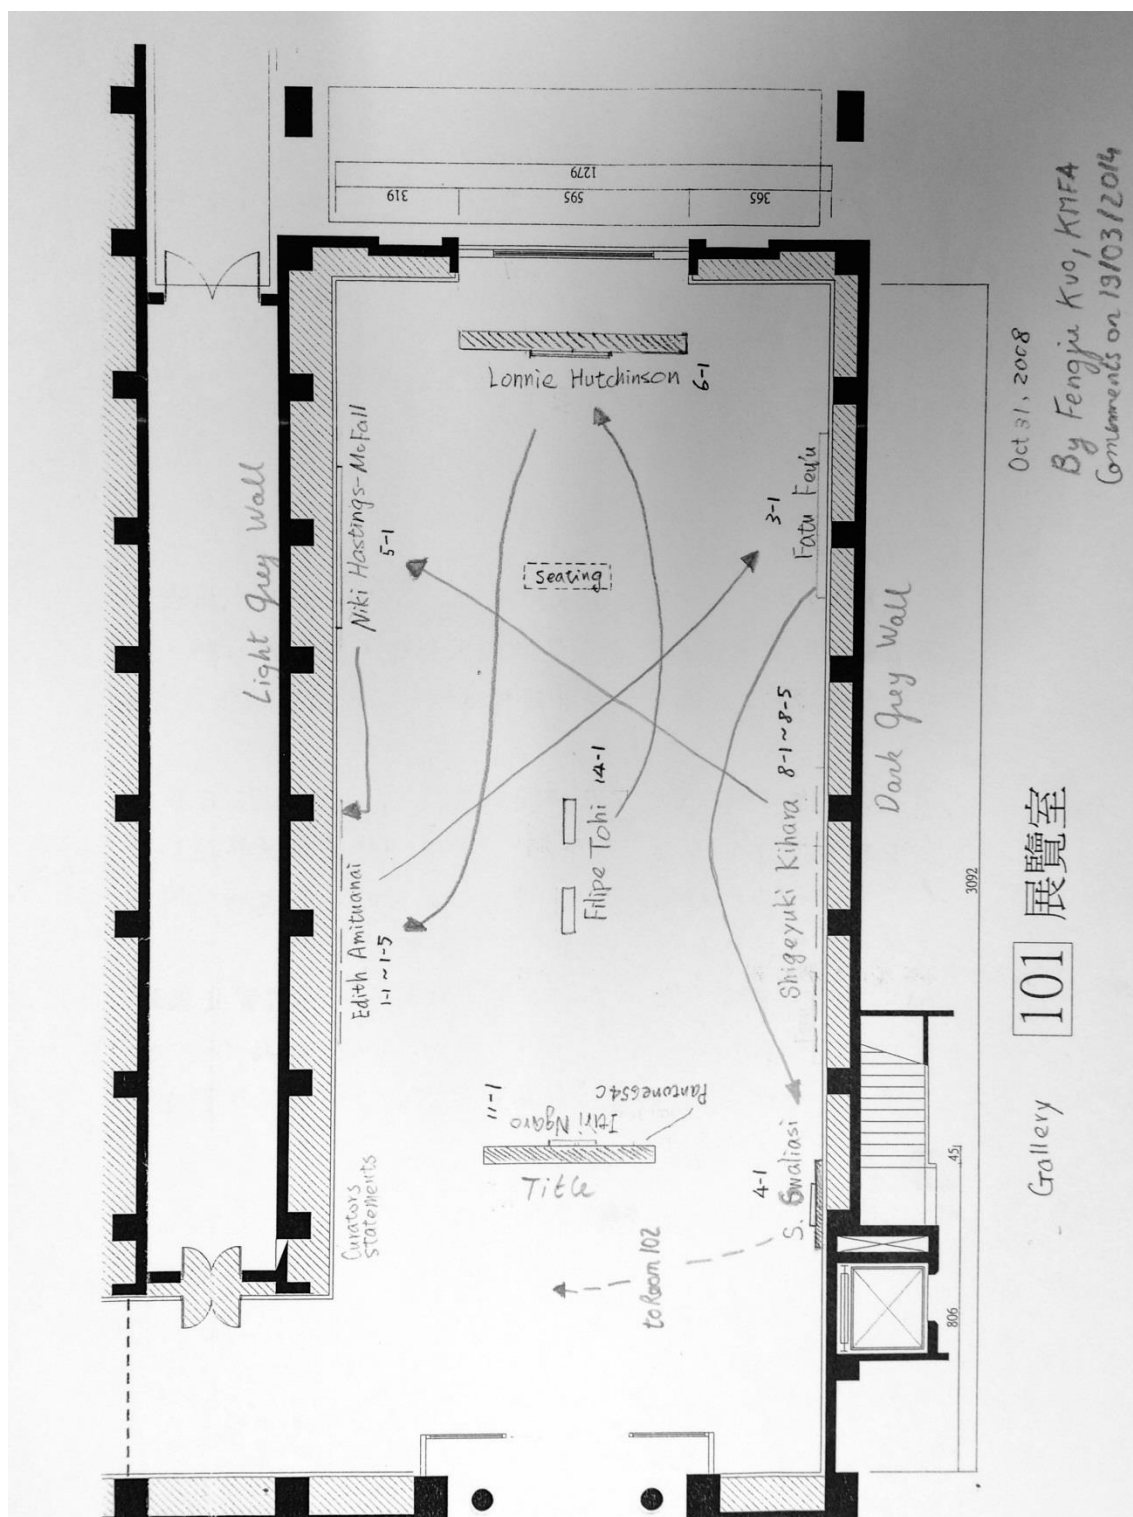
Floor plans, Room 101, LF Taiwan. KMFA archives, 31 October 2008
